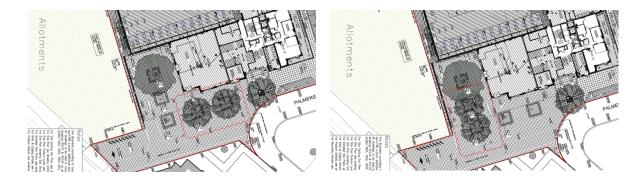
Original plan (left picture) and adjusted tree plan (right) to accommodate gas mains (Reserve matters, 2016)
